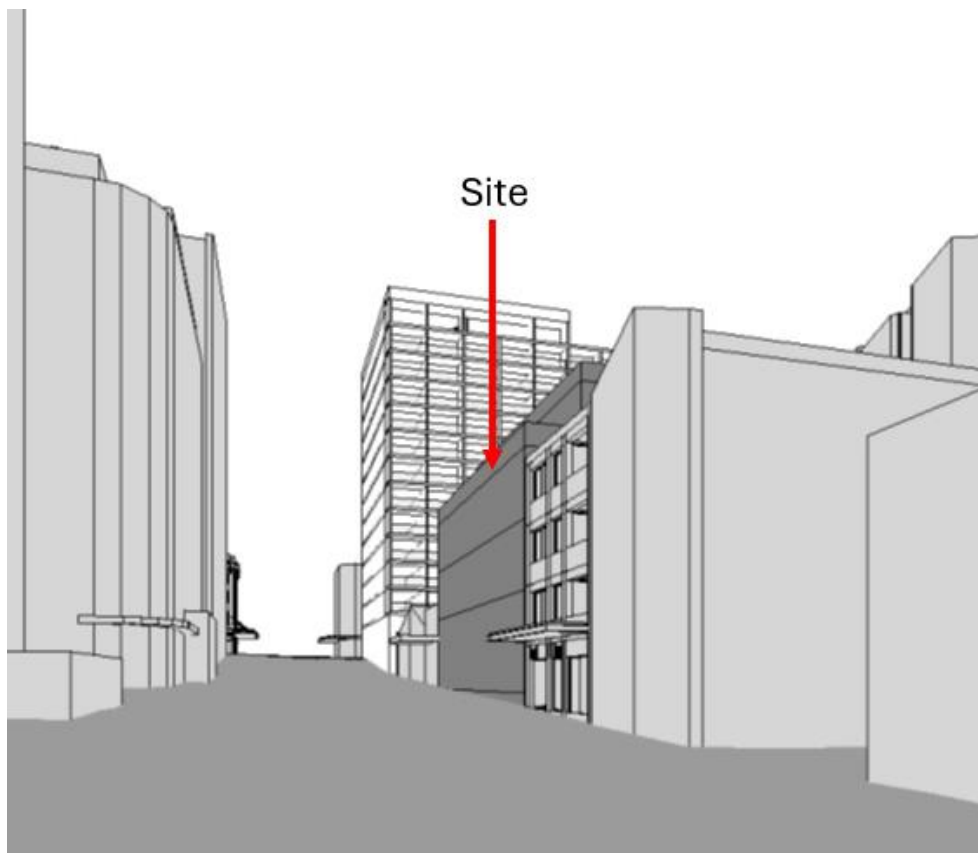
View of building envelope as amended following public exhibition, looking south up Riley Street towards William Street
